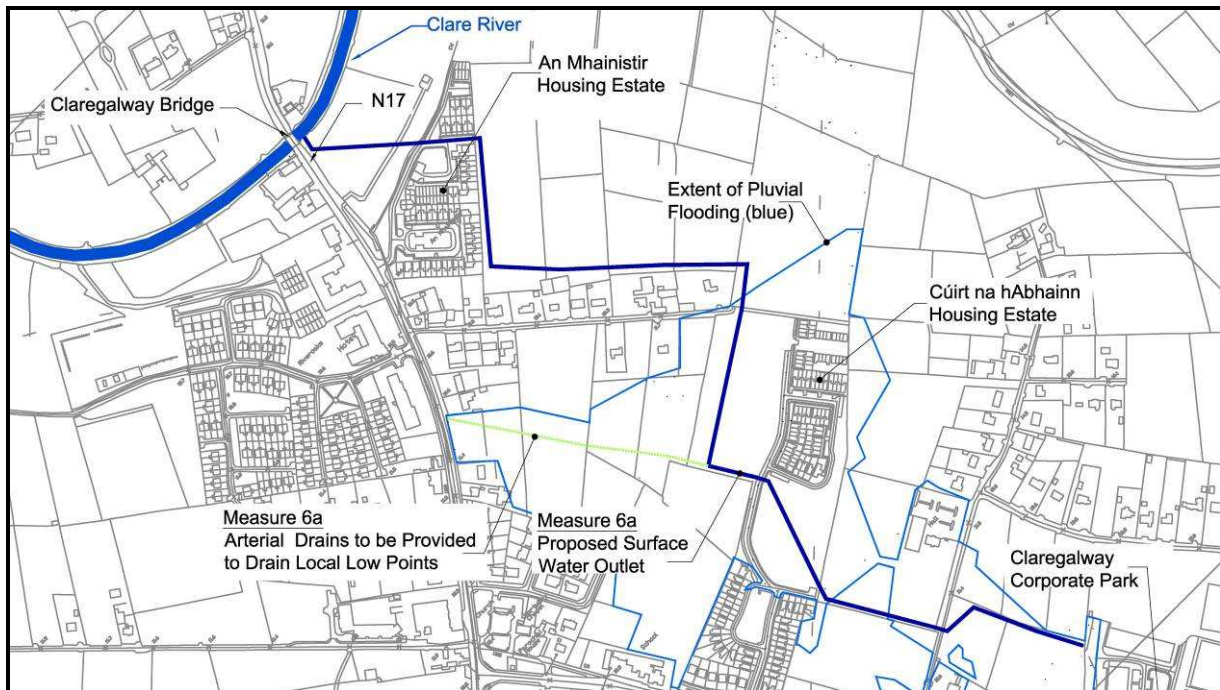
Proposed Surface Water Outlet from Lakeview
